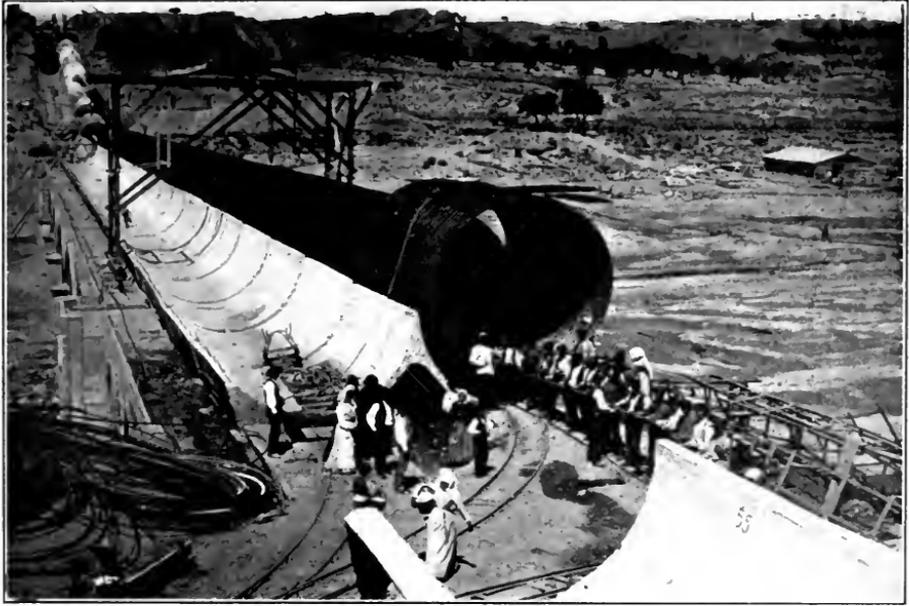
FIG. A.—Placing steel tubes surrounded with outside reinforcement, in cradles. Sosa Siphon, Spain.
